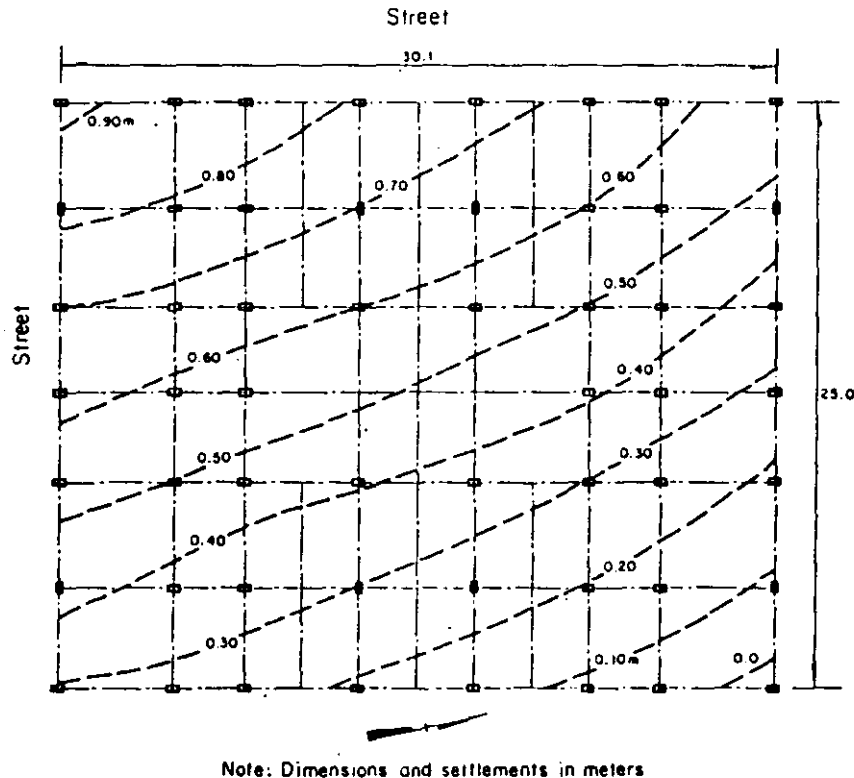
Plan and outline of settlements of Building III on partially compensated foundation.
